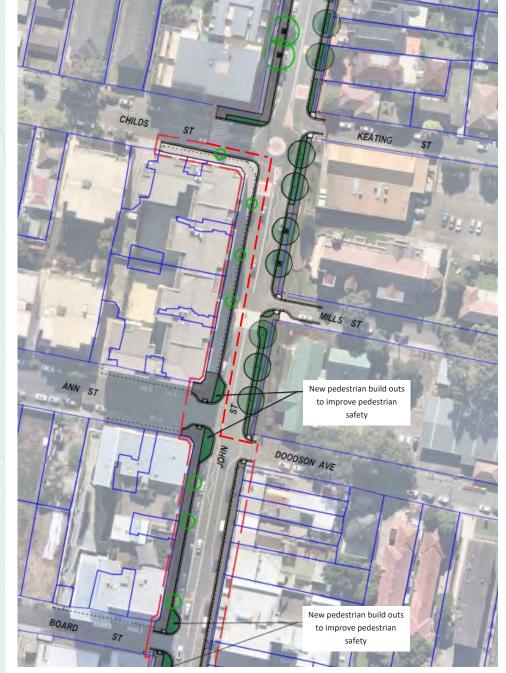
John Street Precinct Concept Plan (Board Street to Childs Street)
